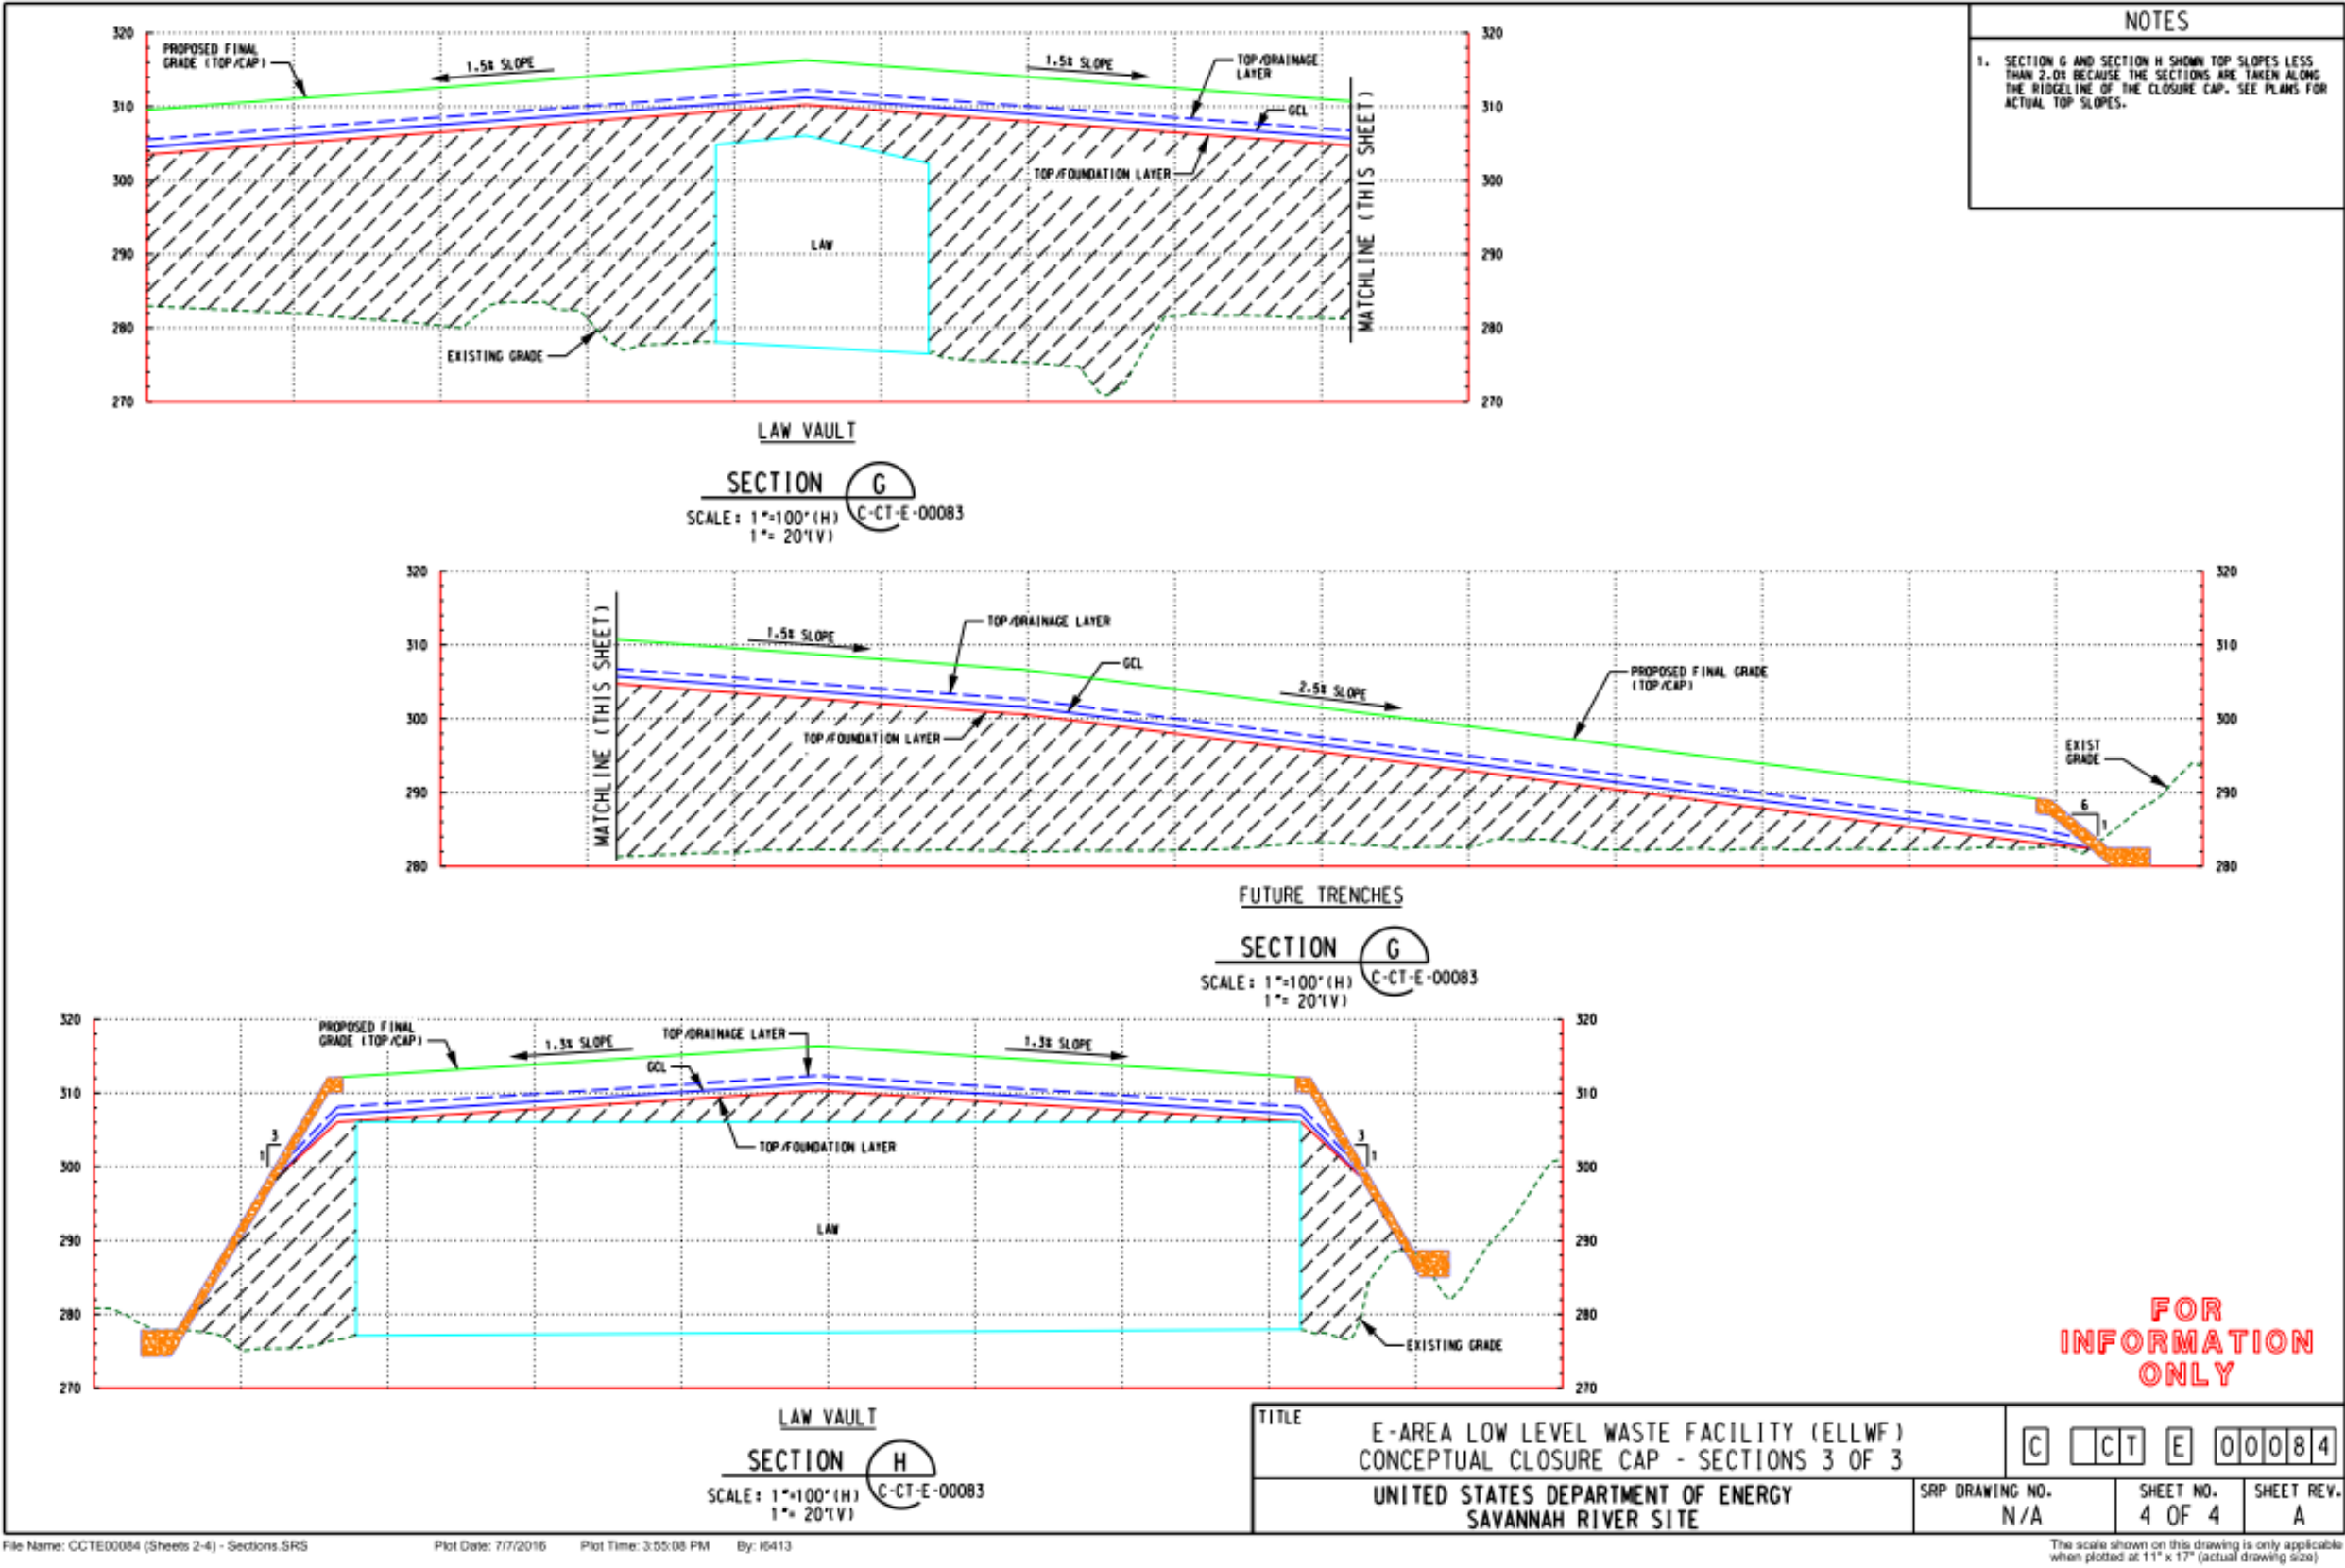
Conceptual Closure Cap Design Details (Sheet 4 of 4) – Cross-Sections for Low-Activity Waste Vault and Future Trenches (C-CT-E-00084, 2016)
